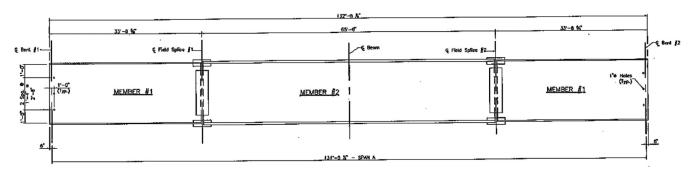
Girder elevation (INDOT, 2011). (Note the girder lengths vary).
